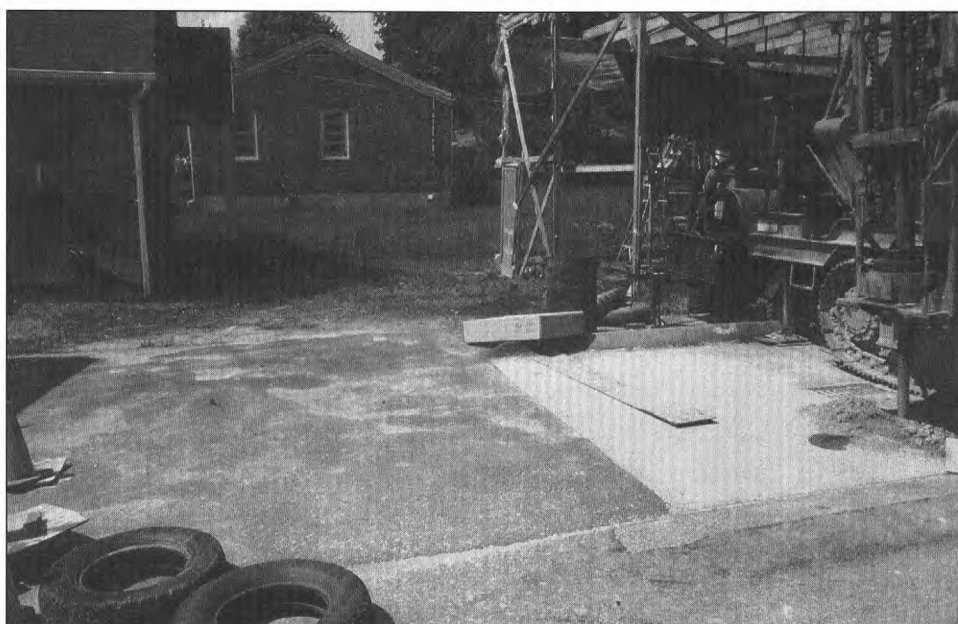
Subsidence damage and abatement effort at MacAurthur, West Virginia. Notice damage to foundation of brick building at left of photo.
